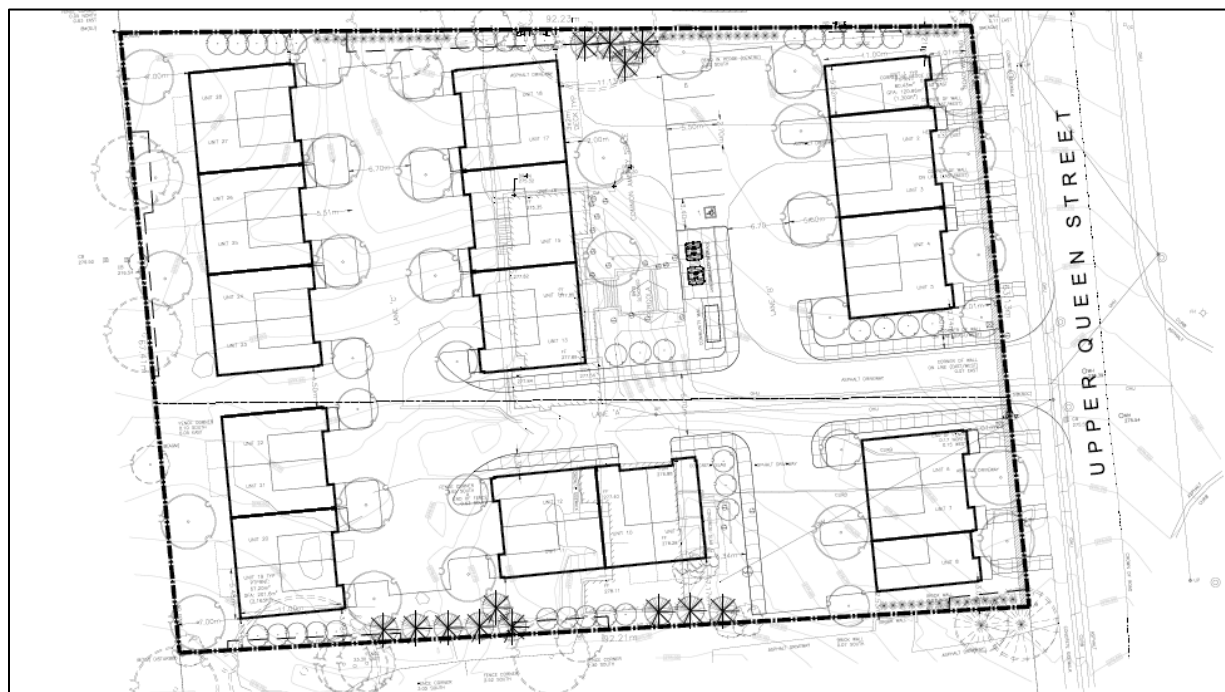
Conceptual Landscape Plan (excerpt, Ron Koudys Landscape Architecture, 2024)
